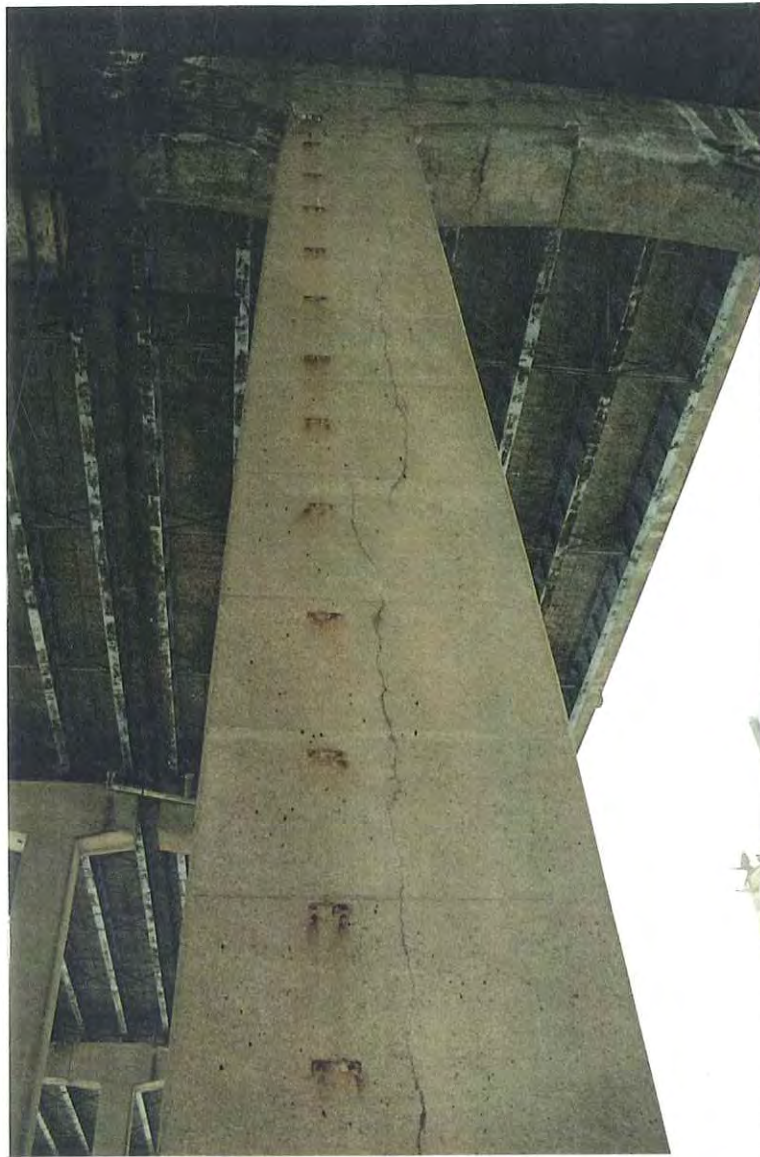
Vertical cracks approximately centered in the width of the column were typical of the crack pattern in the columns. This column supports Pier 40 north-bound.
